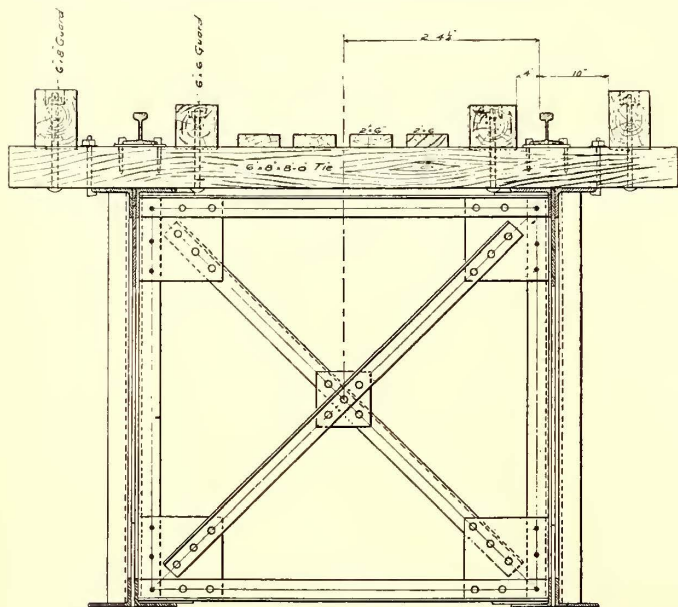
TRANSVERSE SECTION OF PRESENT TYPICAL LOOP SPAN
